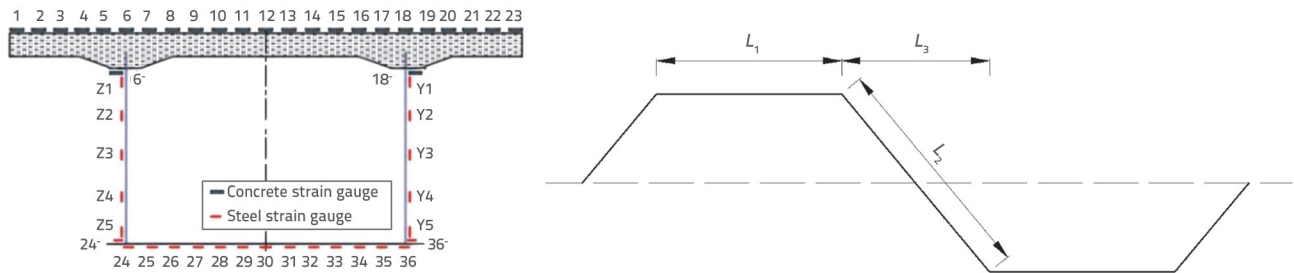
The strain gauge layout of the CS and SB box girder and the geometry of the corrugated web: a) The strain gauge layout for midspan and 1/4-span sections; b) Geometric shape of corrugated steel web
